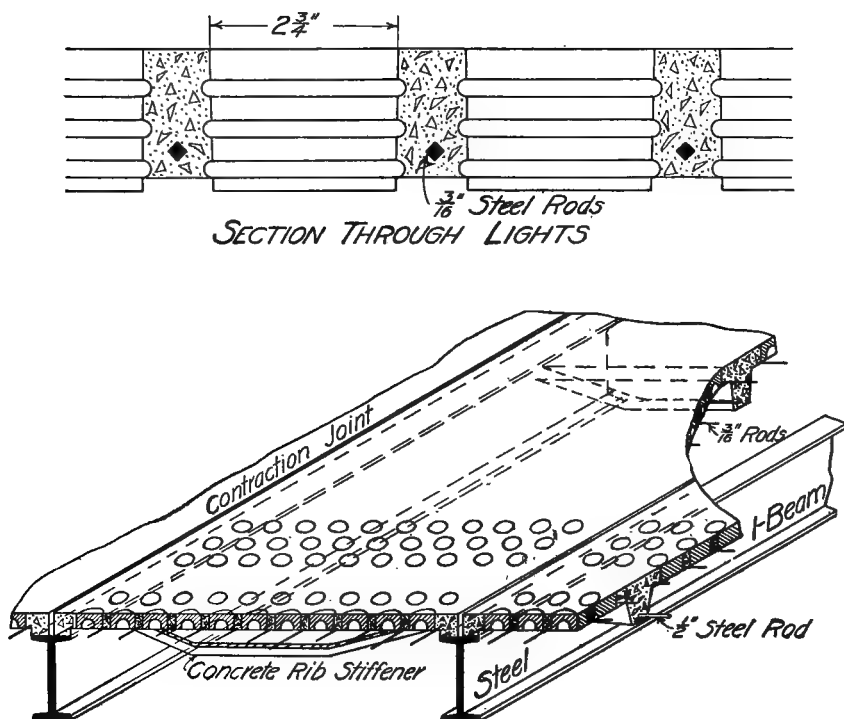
TYPICAL VAULT LIGHT CONSTRUCTION.
